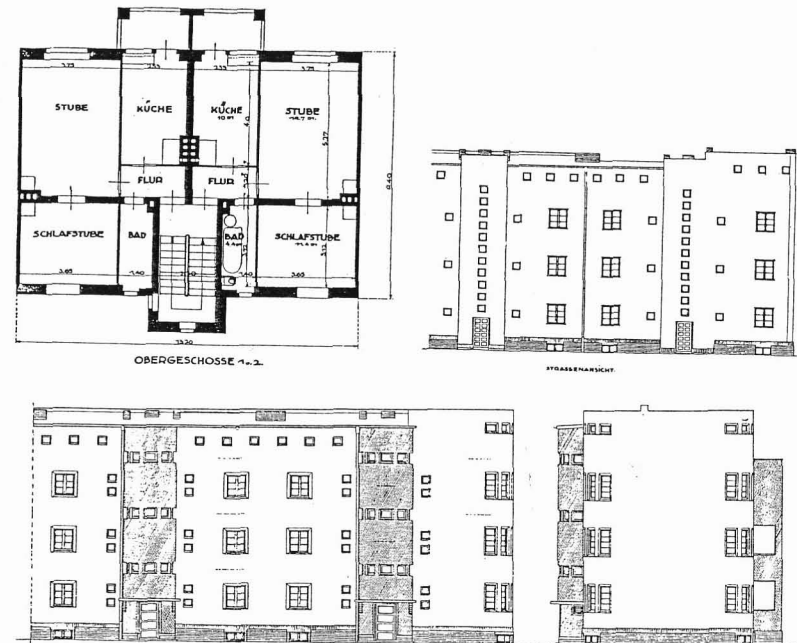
Großsiedlung* Britz, Berlin ('Horseshoe'): floor plan and elevation of section for six families, Type I, by Bruno Taut; street elevation of Type I, by Martin Wagner.
